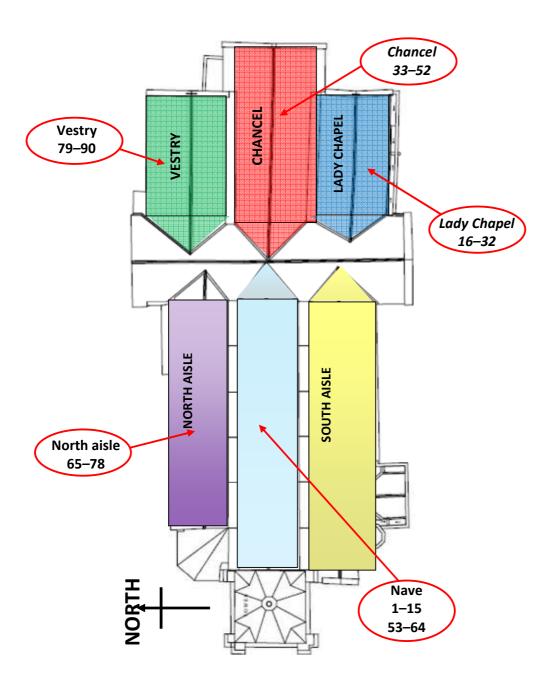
Plan of the roofs to help locate sampled areas (after Chadburn Conservation Architect)
